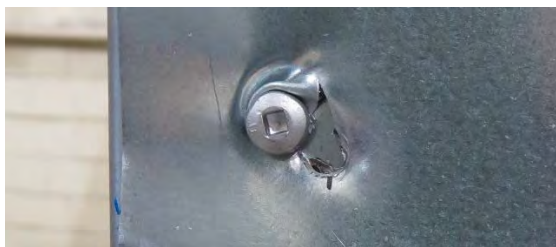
Steel bearing damage in sheathing from double-sheathed configuration
